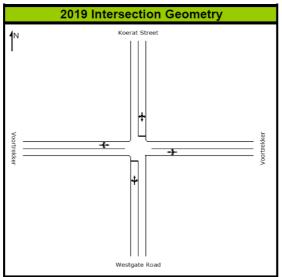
Proposed geometry of the Voortrekker (R102) / Westgate Road / Koerat Street intersection
